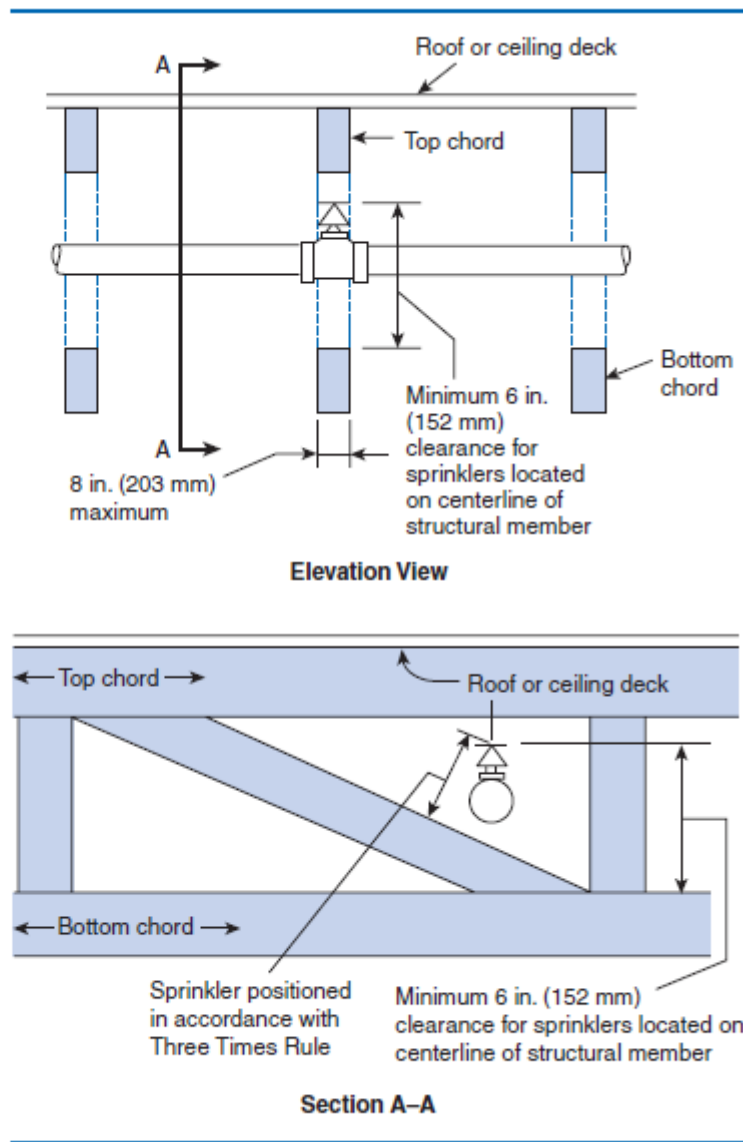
Location of Sprinklers in Open Truss Construction.
